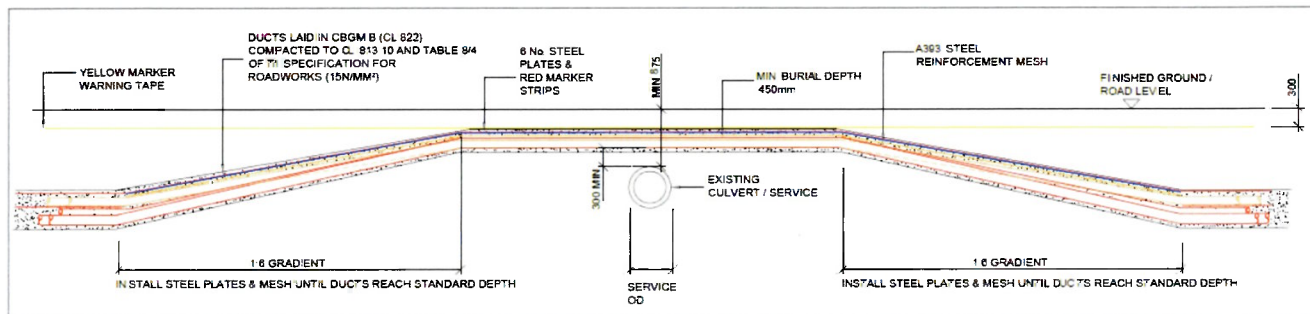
Typical 110kV UGC Culvert Overcrossing
